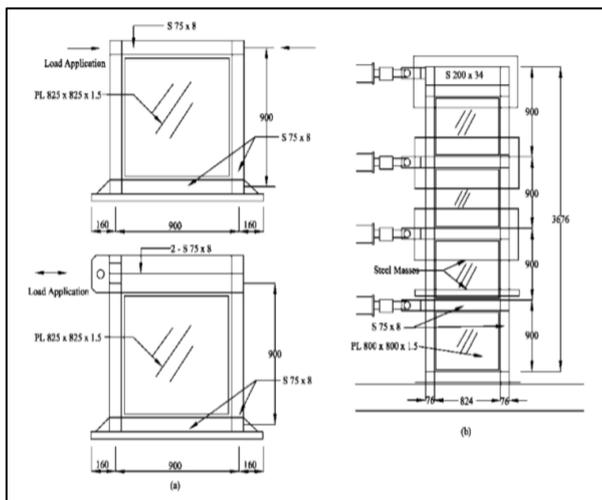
Test specimens of (a) Single story (b) Single story SPSW with stiffer beam (c) Four story SPSW
